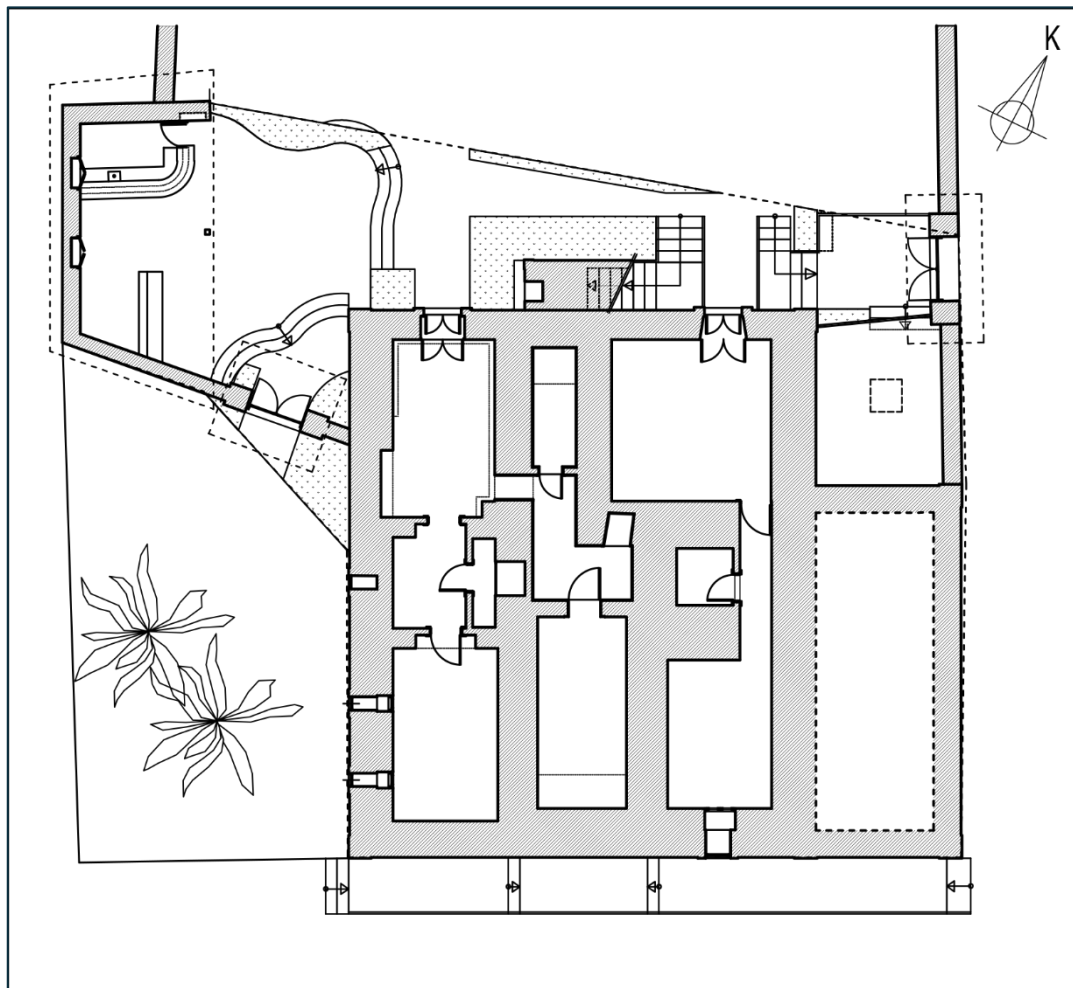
Restoration plan of the basement of Building B. Retrieved from the official restoration drawings of Building B.
